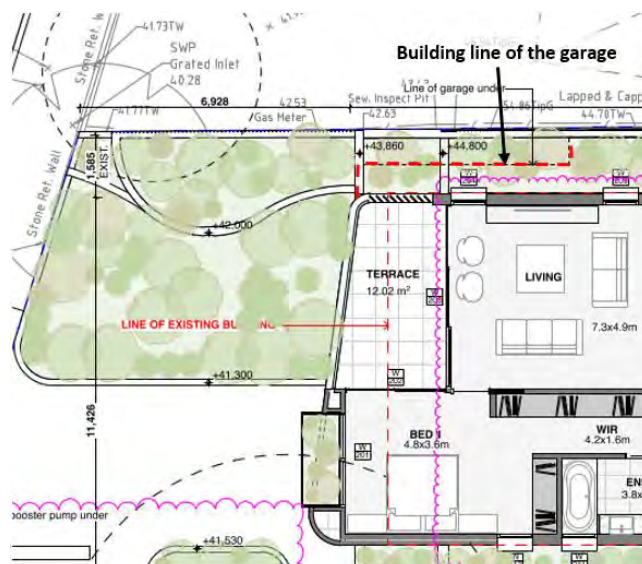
Retaining wall and floor plan (Applicant's proposal)
